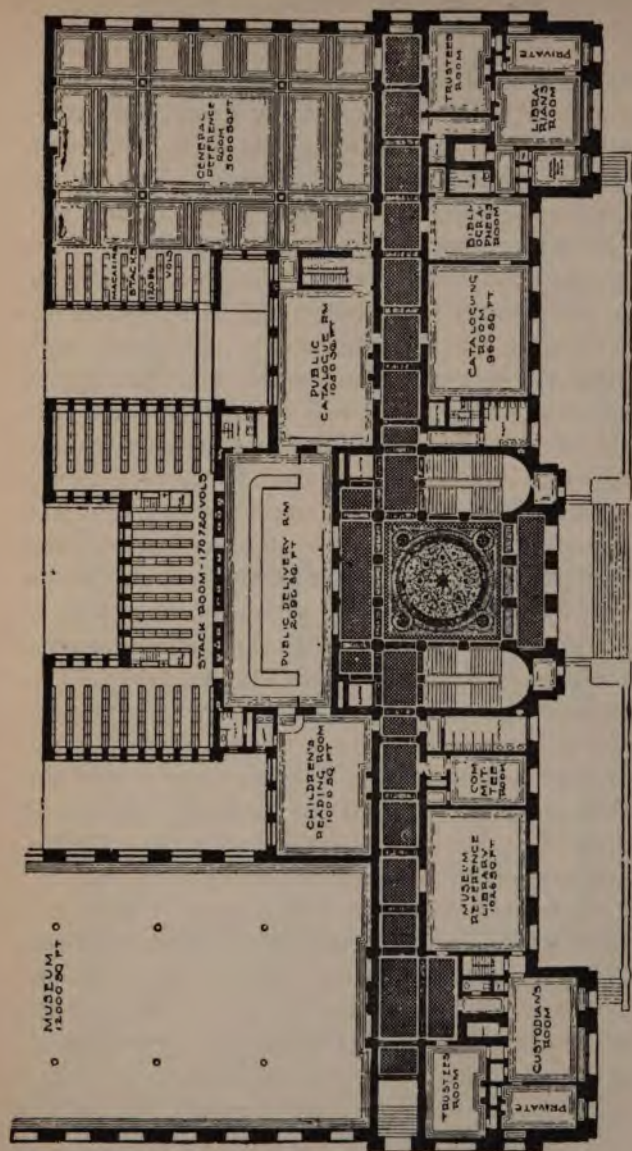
Ground floor plan of the library and museum, Milwaukee.
